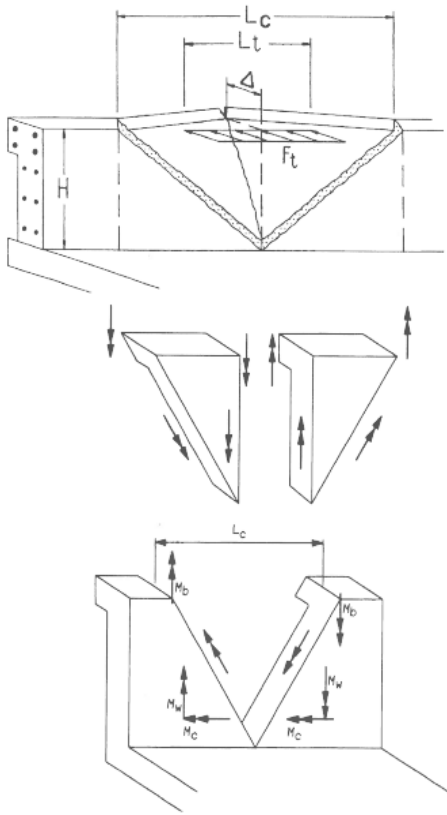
Yield Line Analysis of Concrete Parapet Walls for Impact within Wall Segment
